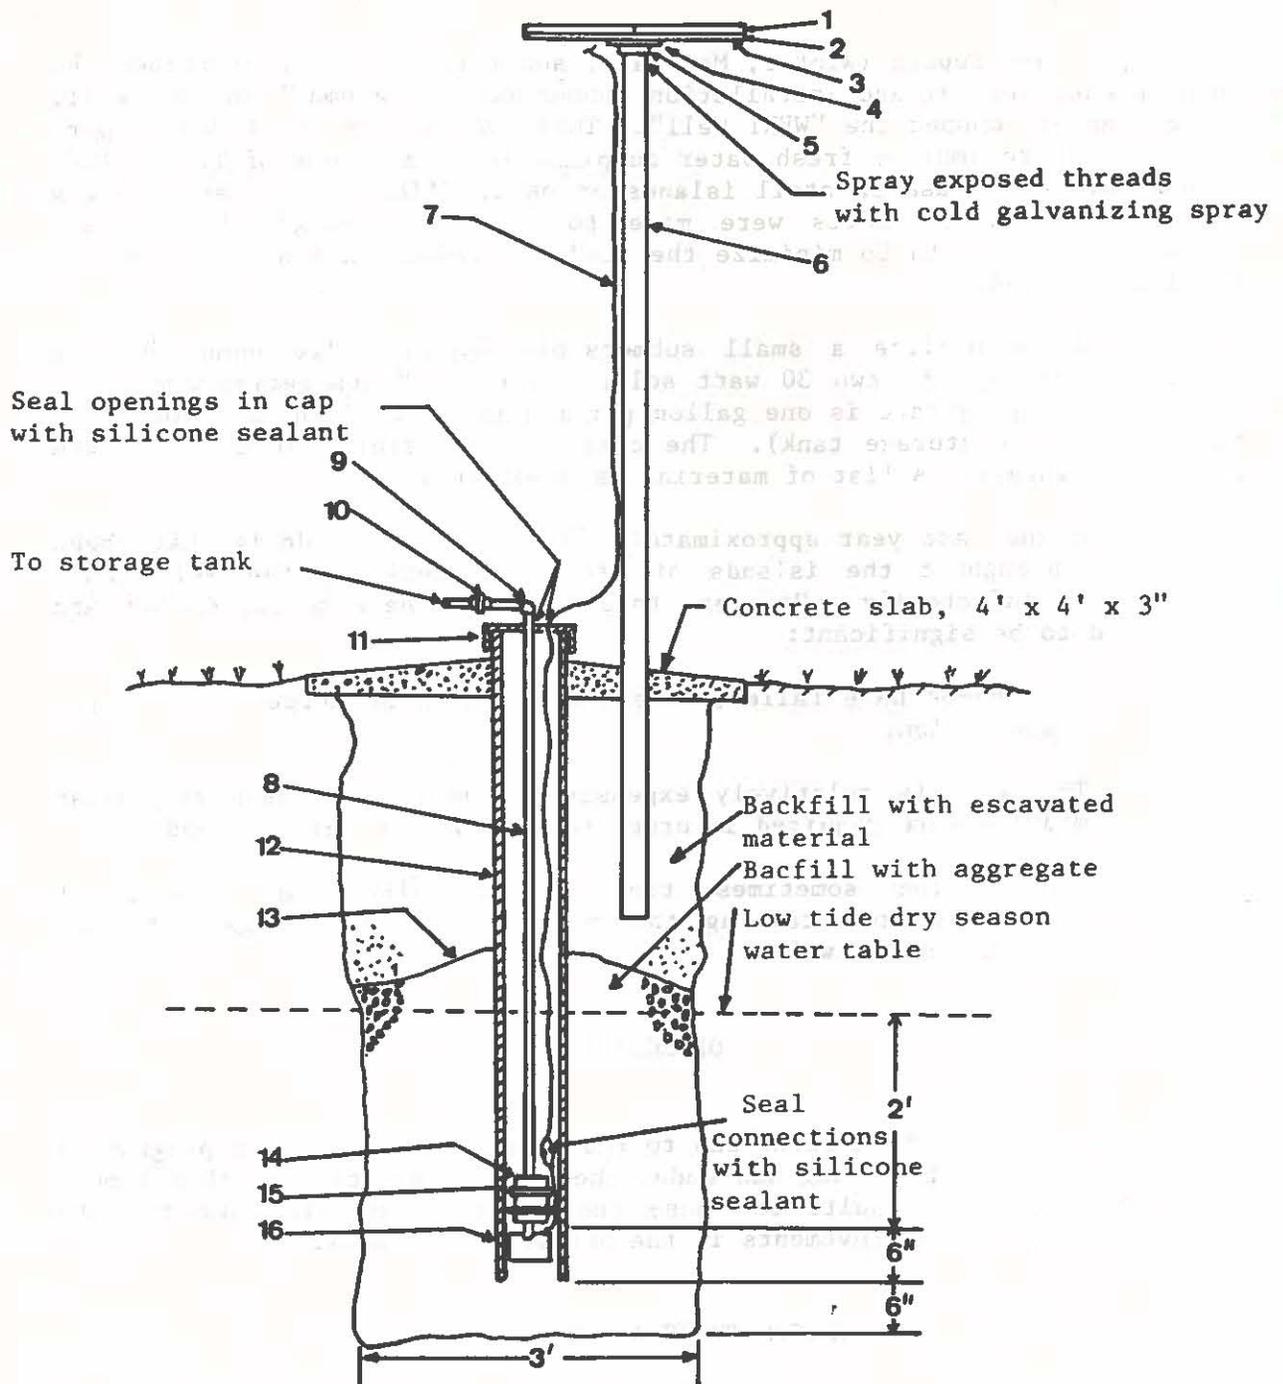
Assembly drawing of the "WERI Well" (not to scale). Refer to Table 1 for a description of parts of the well.
